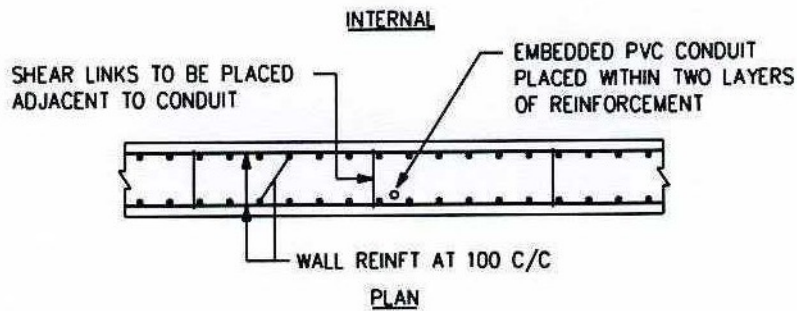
(f) TYPICAL DETAILS OF EMBEDDED CONDUIT IN SS WALL
